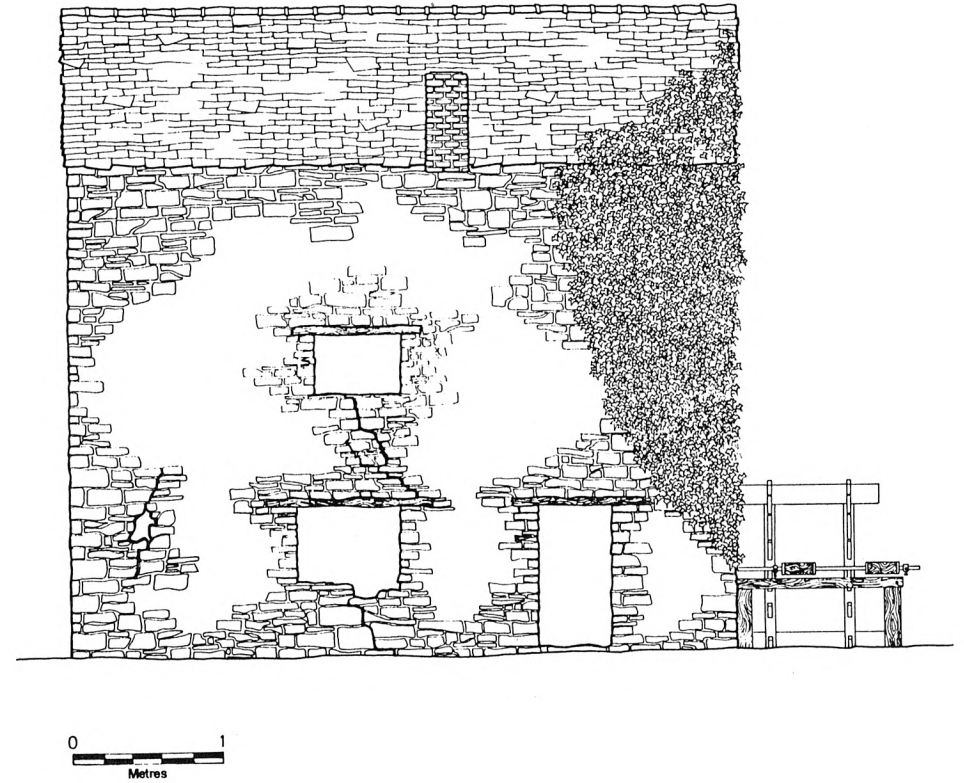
Boughrood Mill. South-west elevation showing sluice and wheel.
